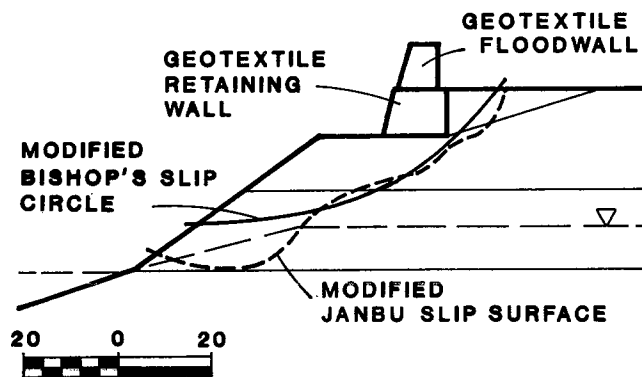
Profile of embankment illustrating slope stability analysis with geotextile retaining wall.
